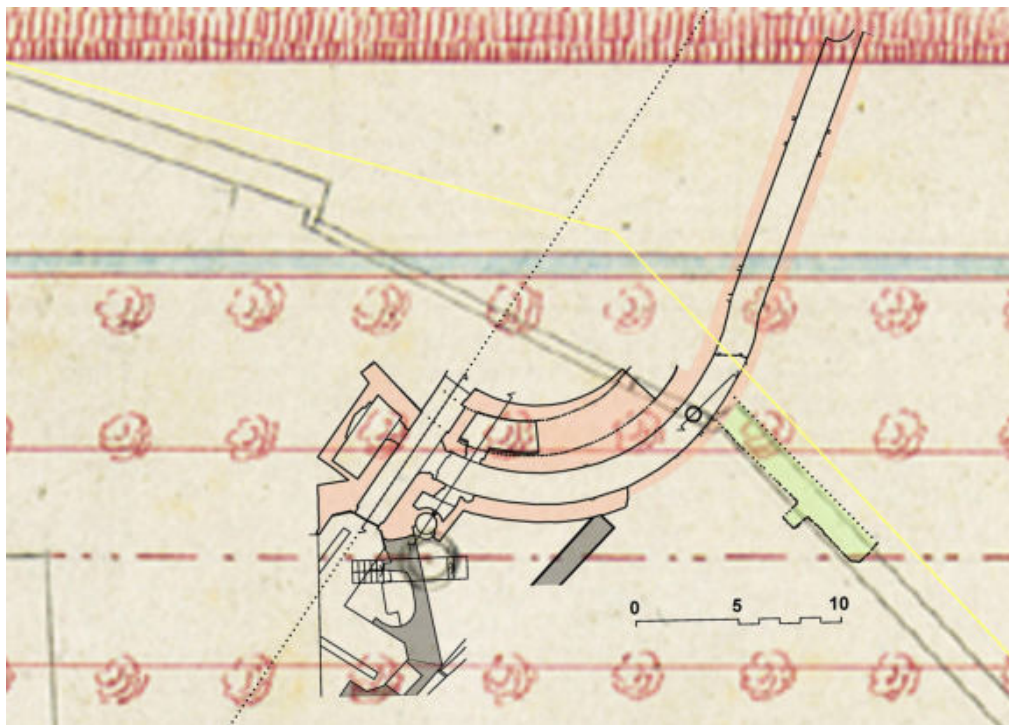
Detail of Pecco's design drawing (ASCT-ALP_4 doc. 8-2) and superimposition of the survey drawing In red are the masonry intersected by the section plan, in grey those below the section plan, in green those above (graphic elaboration by Natta, editing by Spallone)
